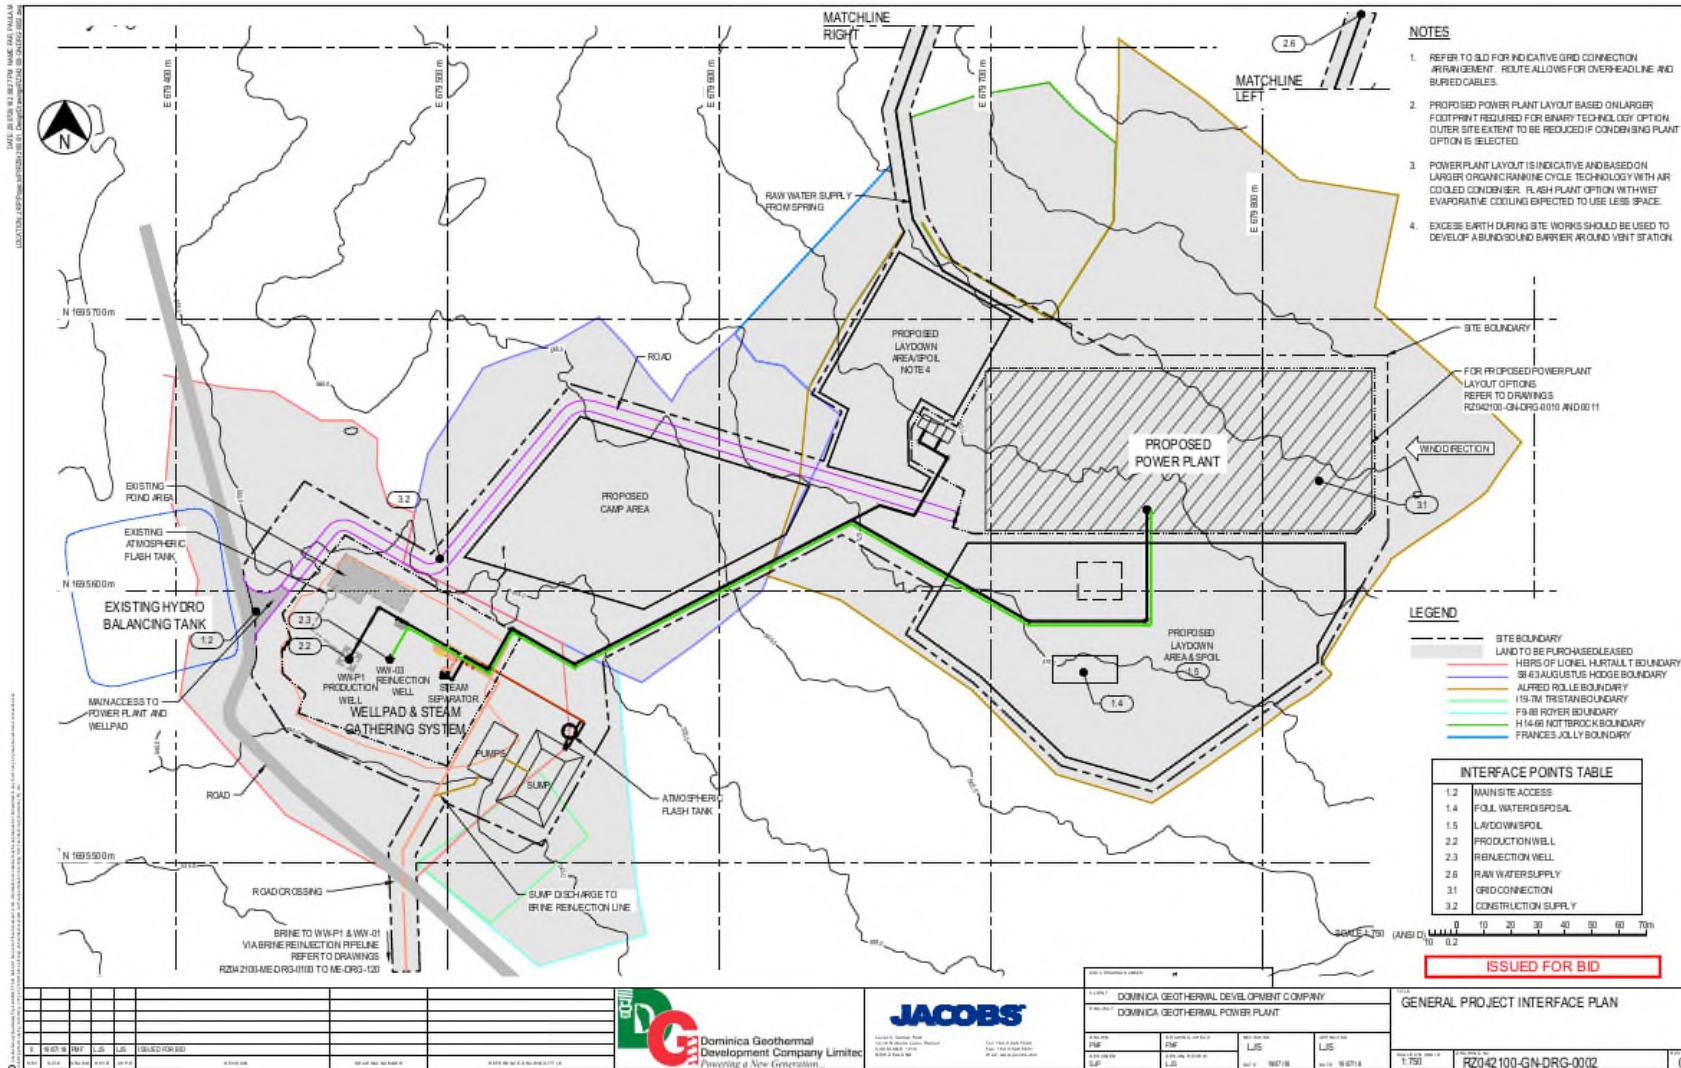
Proposed power plant Site and Production Steamfield Layout
